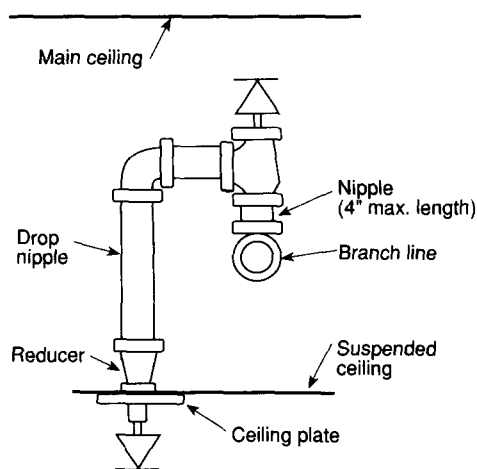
(b) Sprinklers in concealed space and below ceiling.
